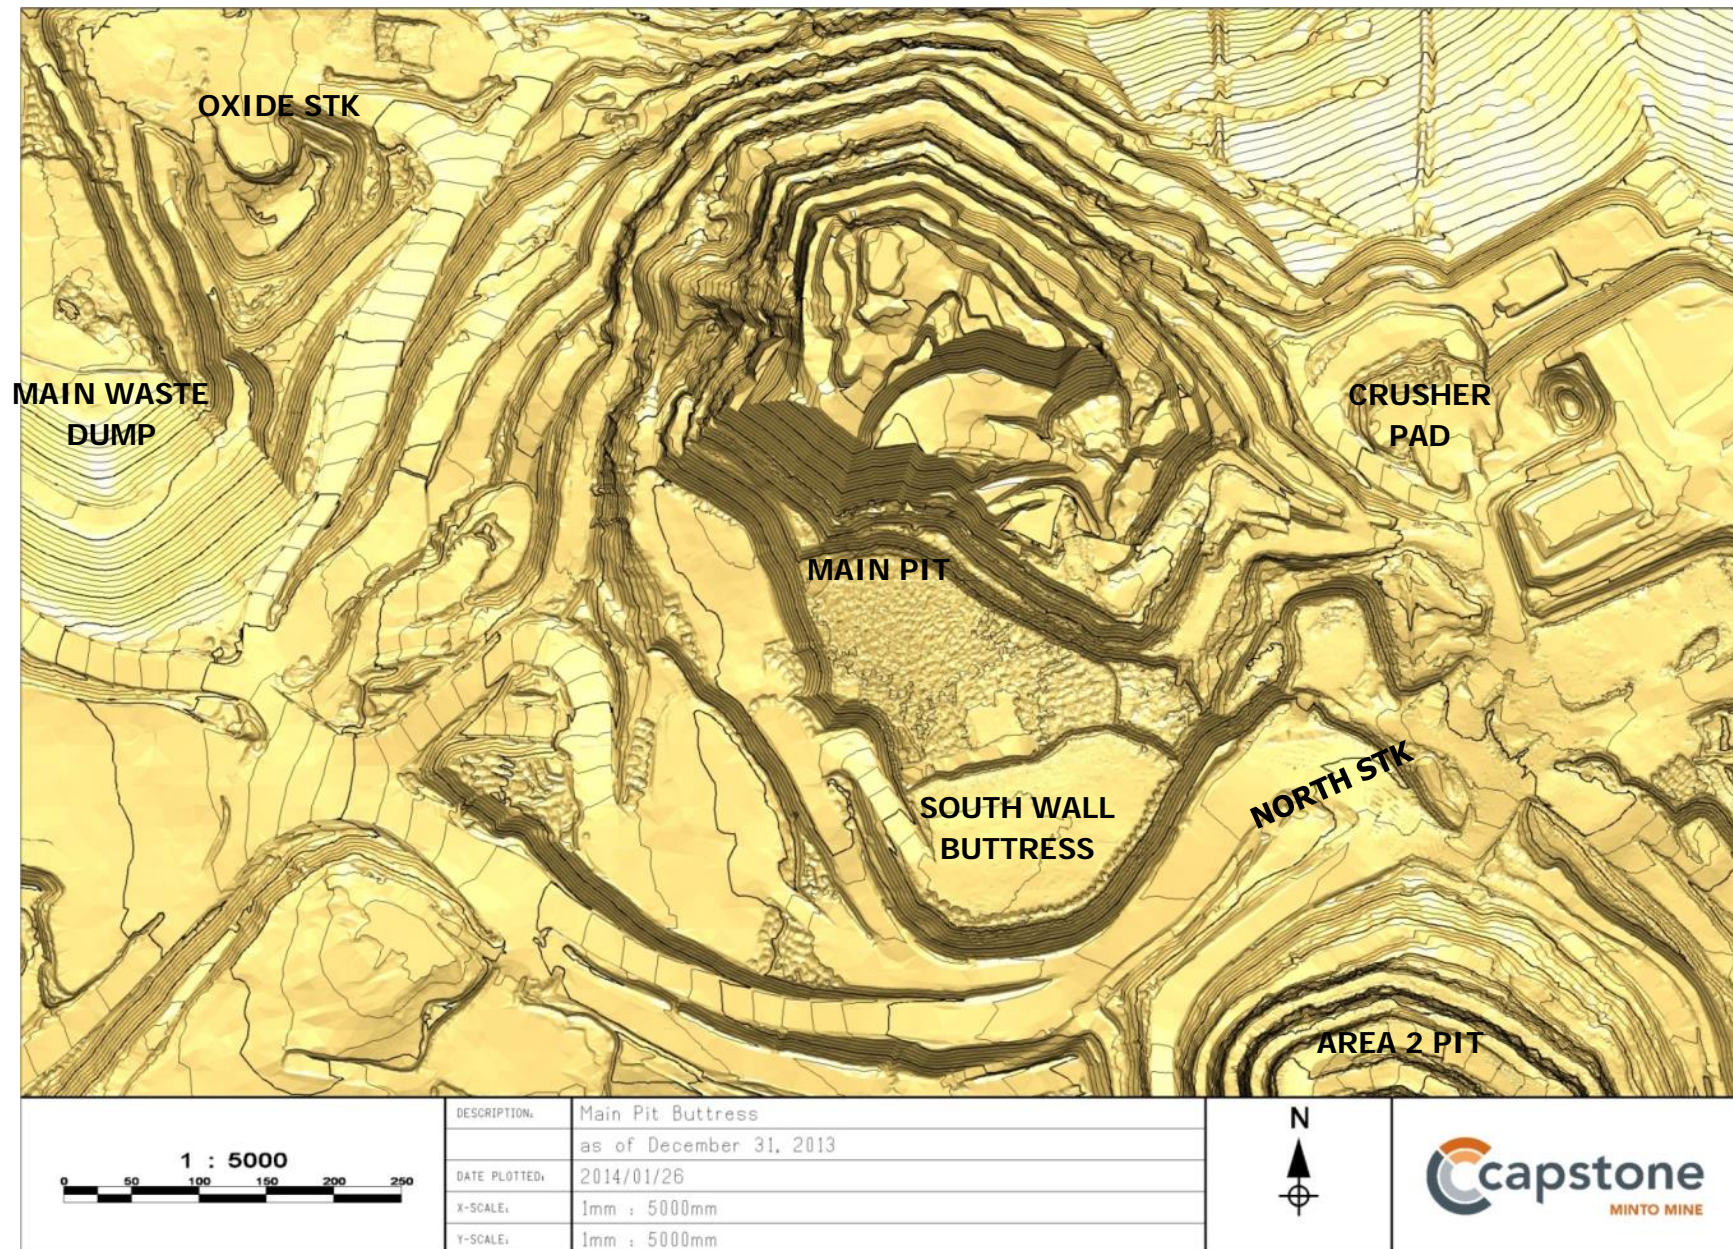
Plan view of the Main Pit and South Wall Buttress as of December 31, 2013
